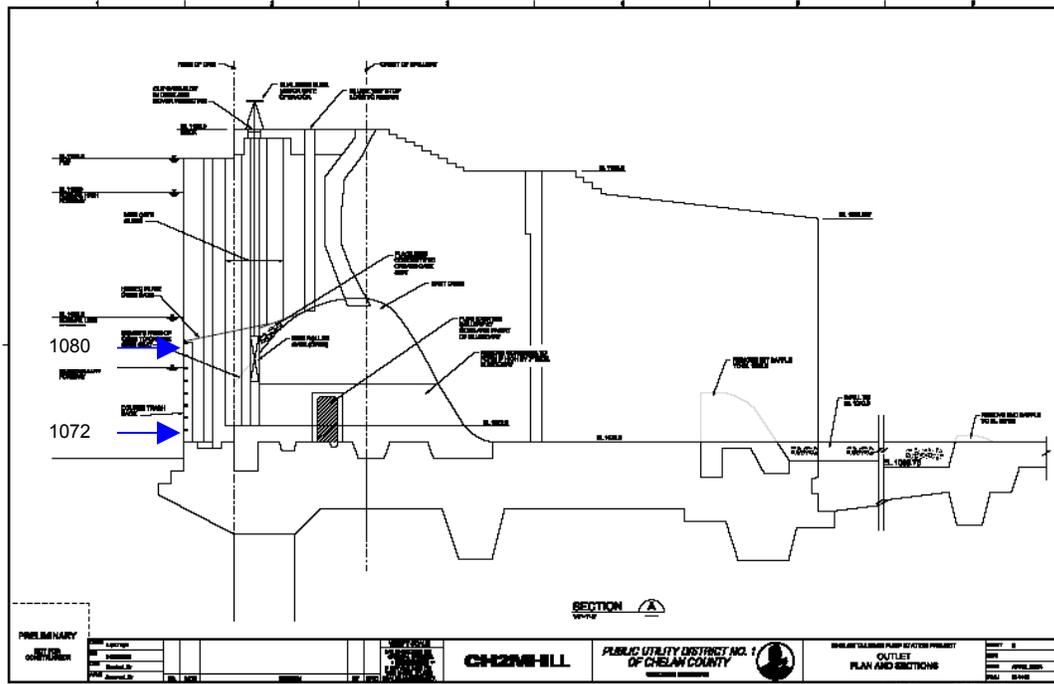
Location of Fixed Temperature Monitoring Site (Arrows) at Potential Outlet Structure at the Existing Spillway Trash Sluiceway
